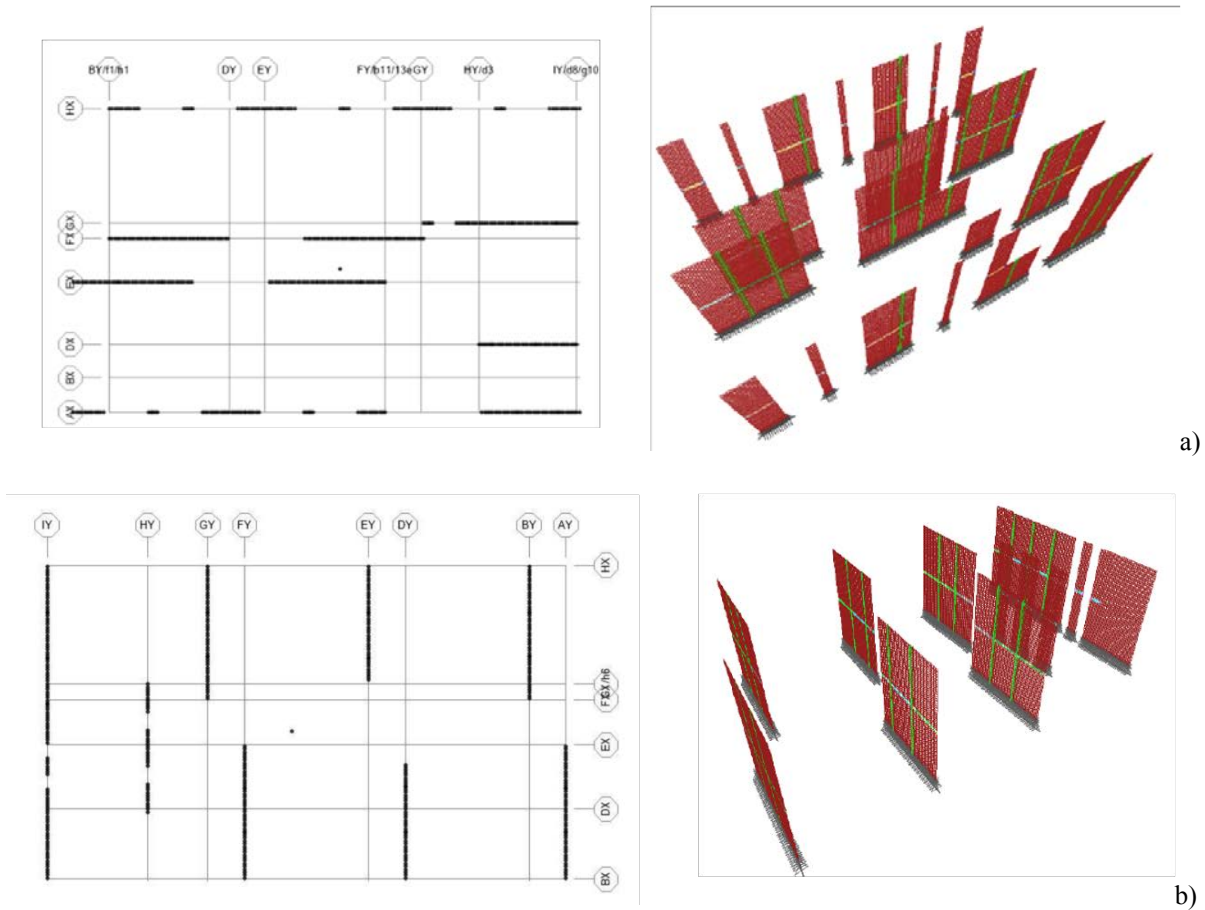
Wall geometry and the structural model of the cases of the Group 1: a) direction X, b) direction Y.
